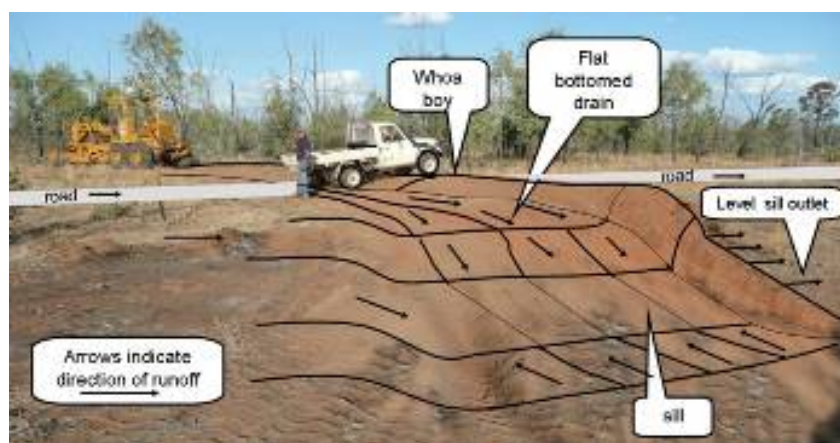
A whoa-boy with a sill outlet to spread runoff.
